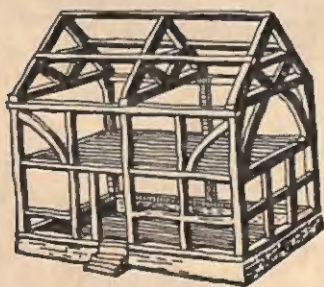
When the framing of the walls was made strong enough to support the roof, crucks were no longer needed. Notice the curved timbers (brackets) that were used to strengthen the framework.
